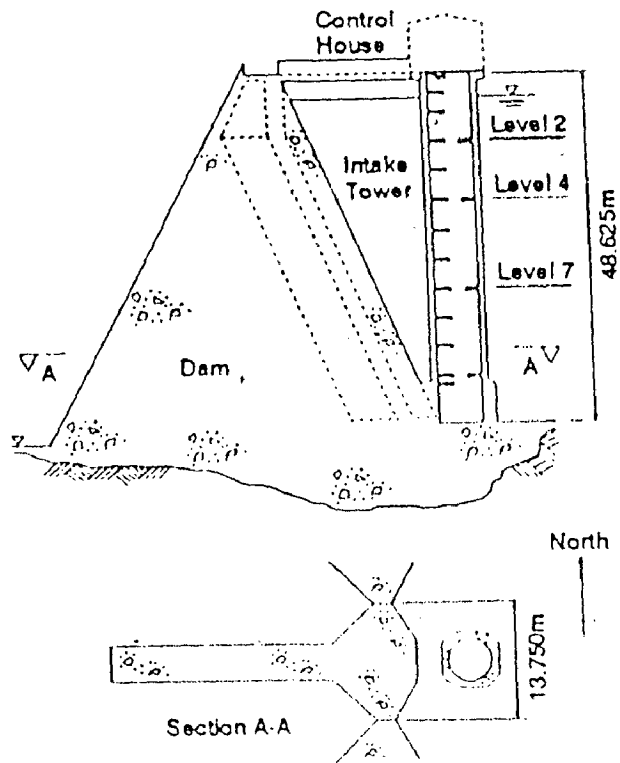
SECTION THROUGH BUTTRESS OF DAM AND TOWER
